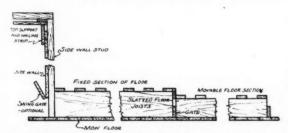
Right half cross-section view of the duct and slatted floor of Fig. 3, showing the arrangement of fixed and movable slatted floor sections, with fixed gate for restricting air flow into the space under the movable section of slatted floor
